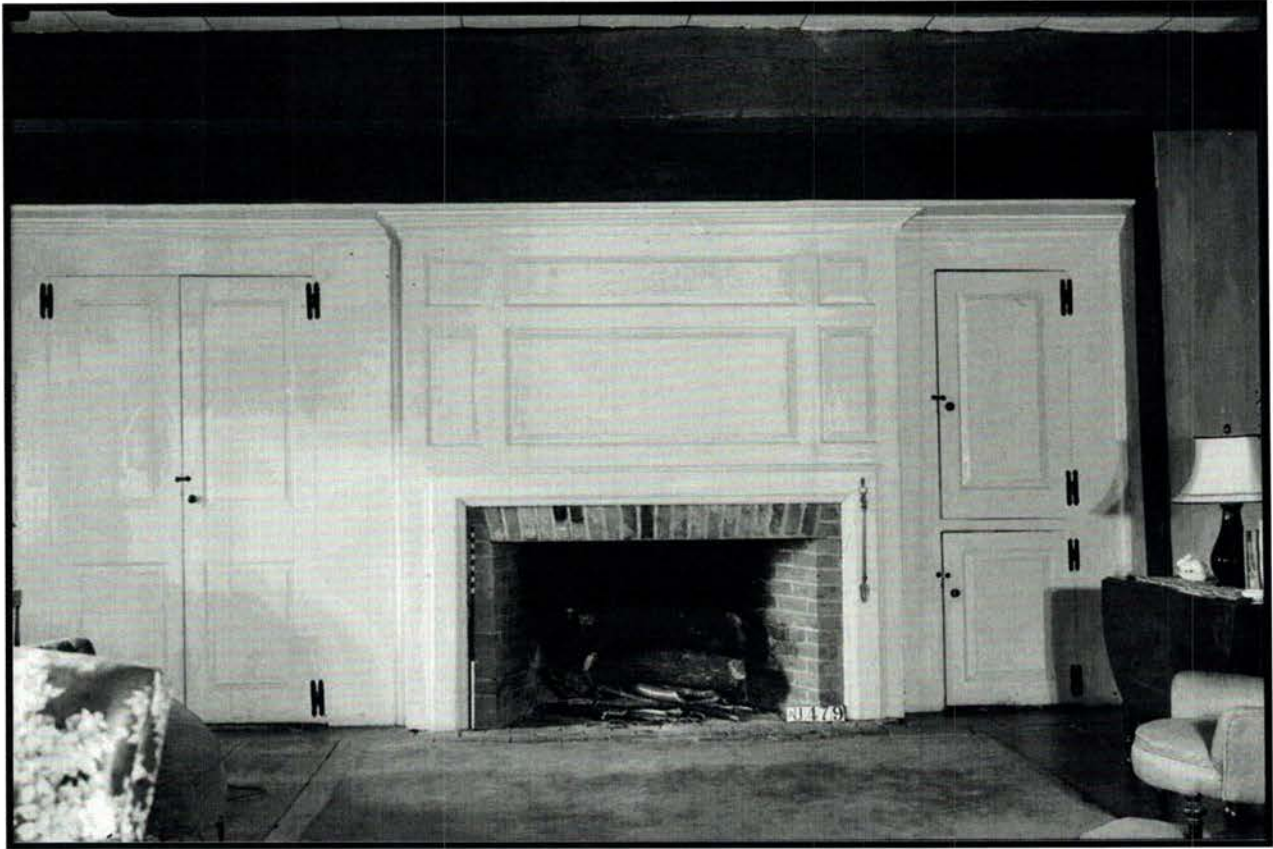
Van Wickle House, living room (Room 103), south fireplace wall, 1938 [HABS NJ-479]
